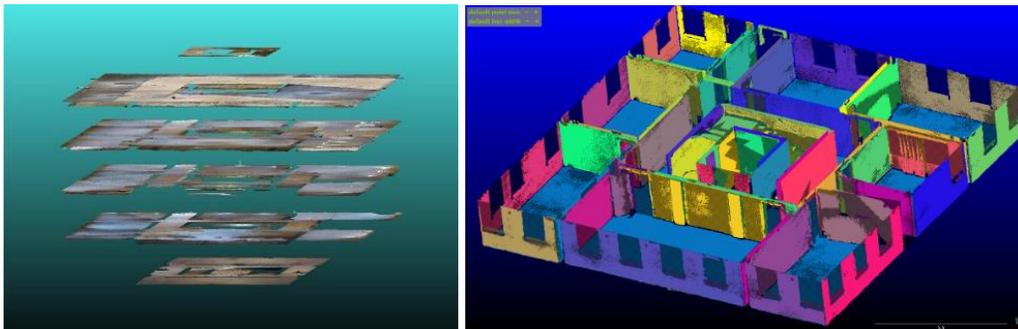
Floor and ceiling segmentation of the PC mesh (left); Building Floor segmented (right)
